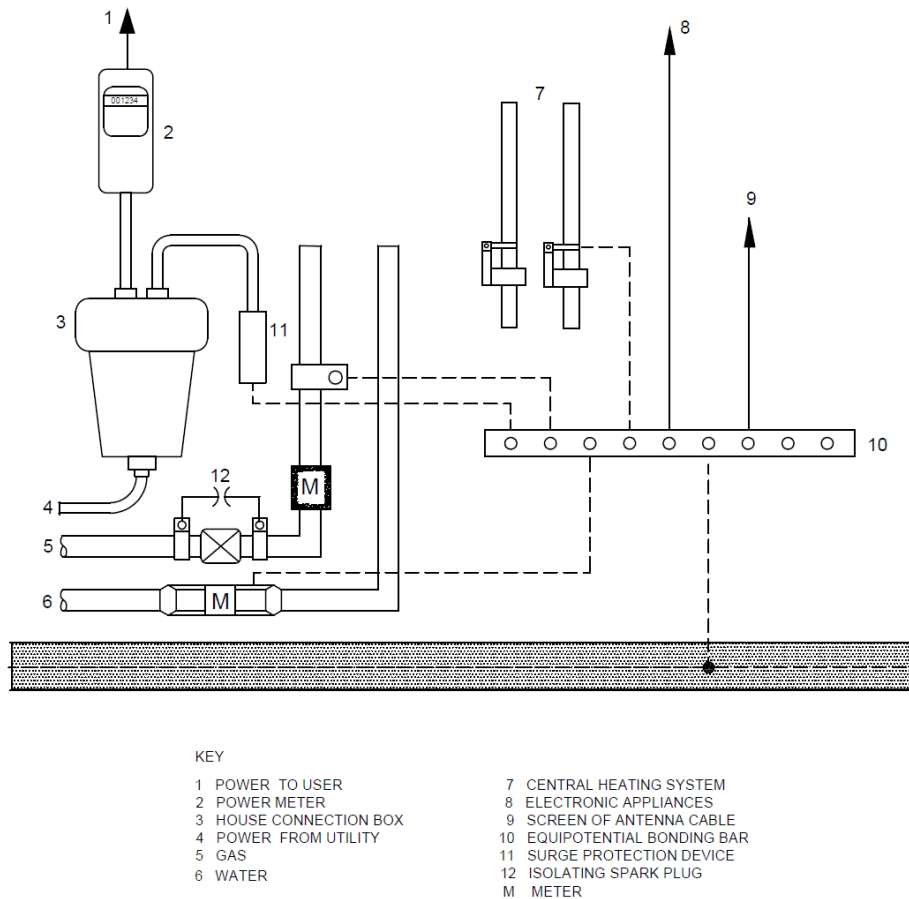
EXAMPLE OF AN EQUIPOTENTIAL BONDING ARRANGEMENT
